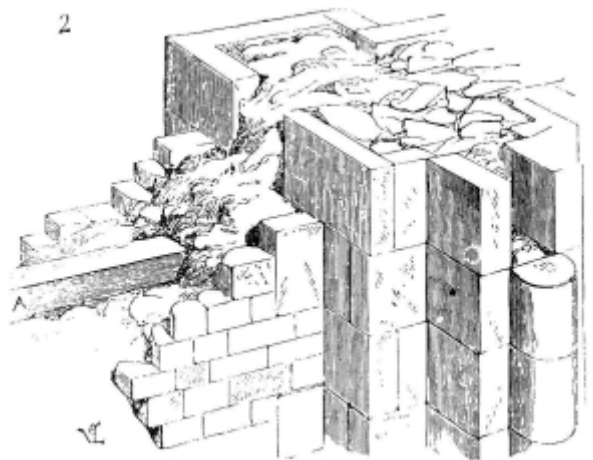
Example of a section of a three leaf masonry wall according to Viollet-le-Duc.
